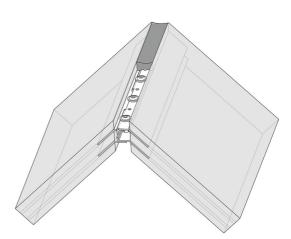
Connection detail AA (Marinitsch et al. 2015b)
